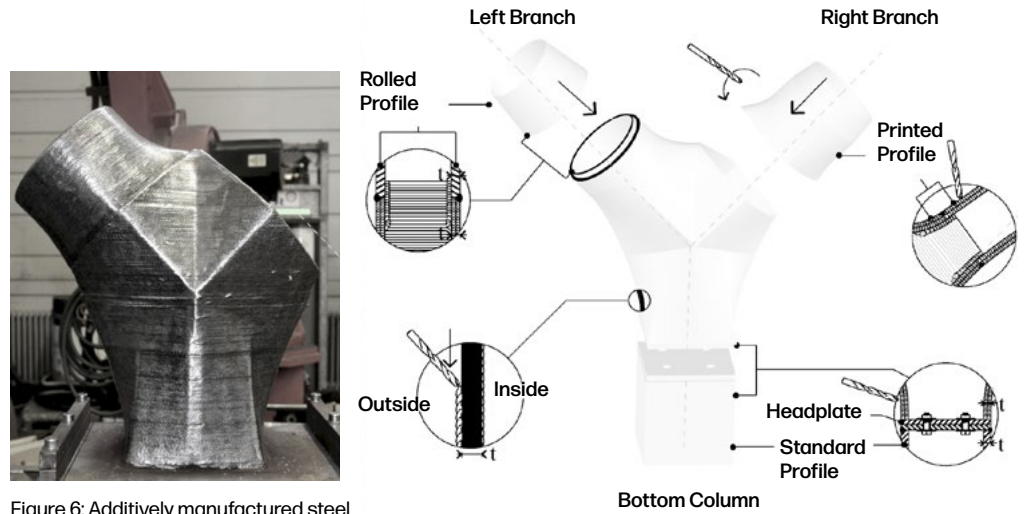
Additively manufactured steel node (left); Connecting methods to join elements of different shape and manufacturing (right).
